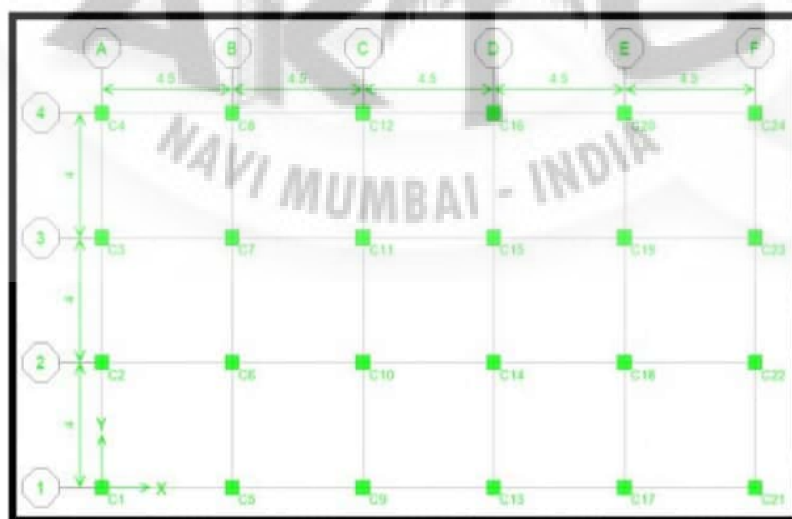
Plan of (P+7) RCC Building (Codal Provision)
